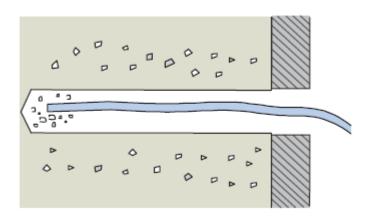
Cleaning the primary hole (Through-fastening type)
